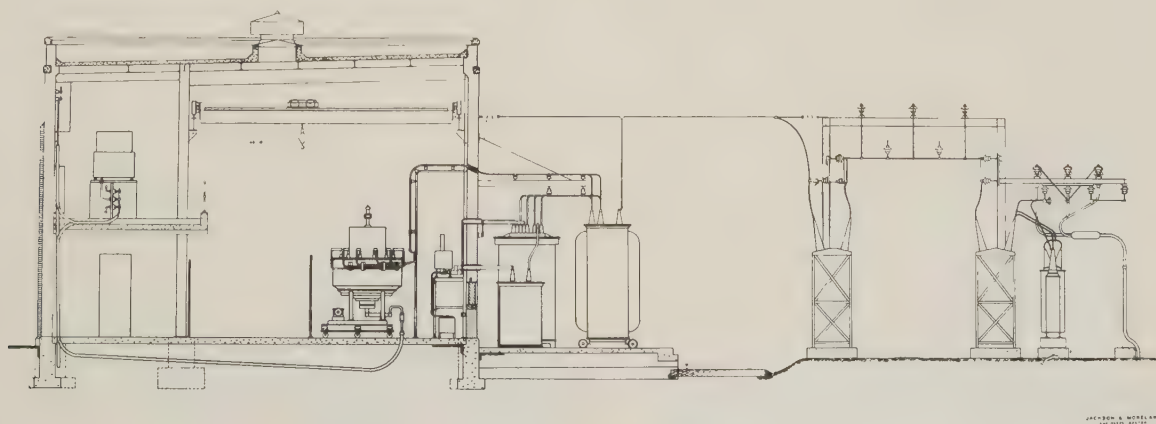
Transverse sectional elevation of a typical Lackawanna substation showing equipment arrangement
